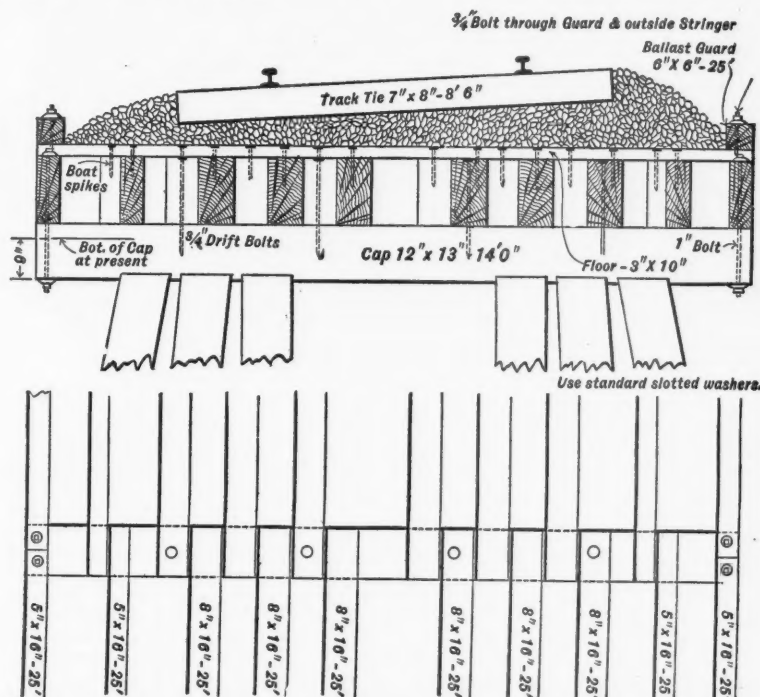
Ballast Floor for Trestle, N., C. & St. L.
